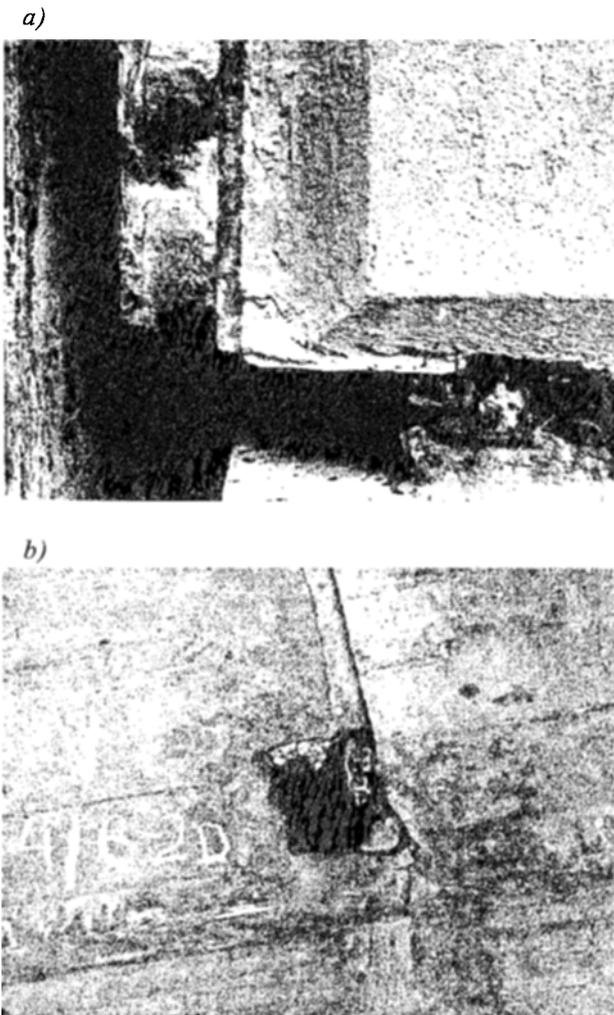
Corrosion of exterior anchors of tendons: a) – at the edge of simple beam; b) – at the joint of segmental post-tensioned bridge beam
